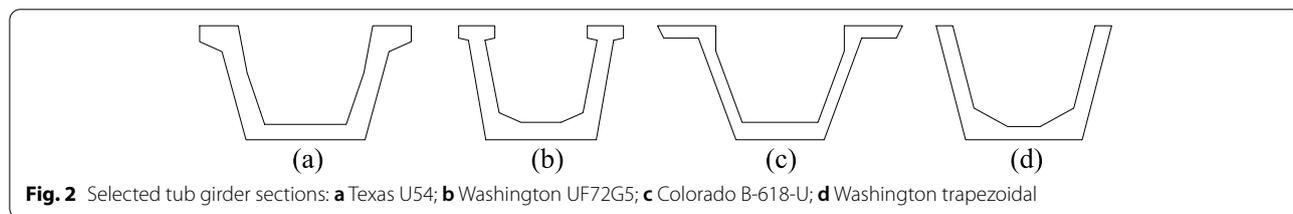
Selected tub girder sections: a Texas U54; b Washington UF72G5; c Colorado B-618-U; d Washington trapezoidal
